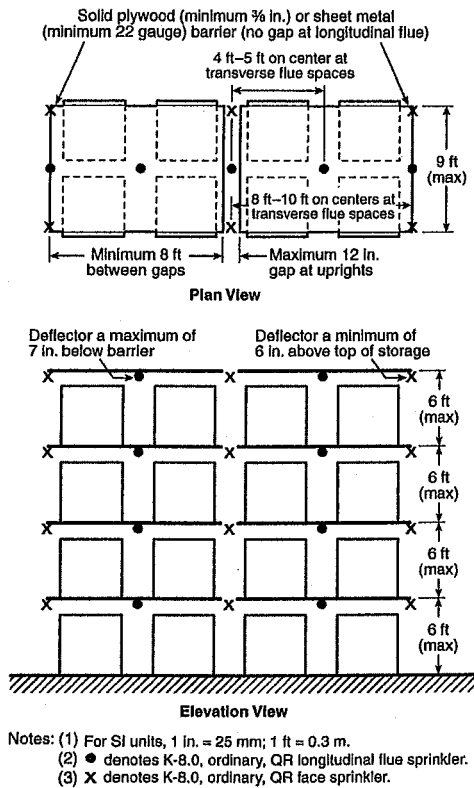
(c) Double-Row Rack Sprinkler Layout for Design Scheme “B.” [30: Figure 16.6.2.1(c)]
